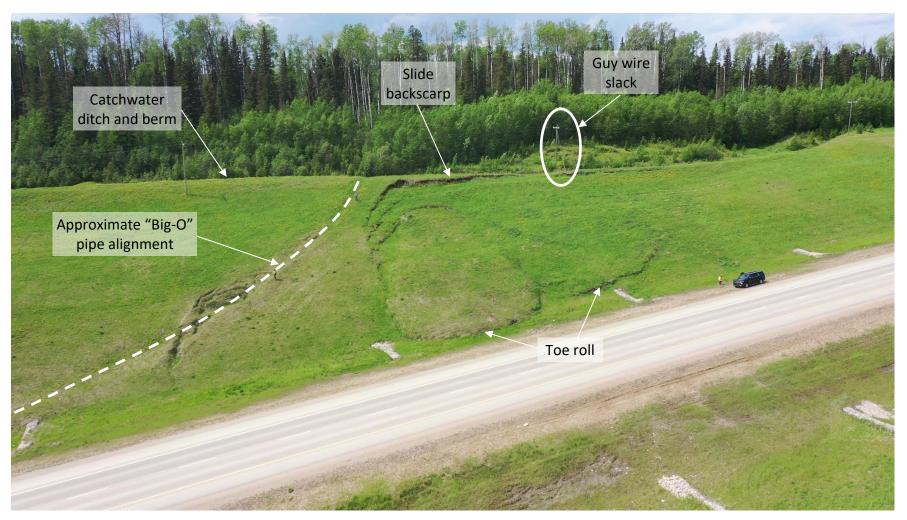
Slack power-pole guy wire at crest of backslope at WP229. Guy wire anchored adjacent to slide backscarp. Photo taken June 16, 2022, facing northwest.
